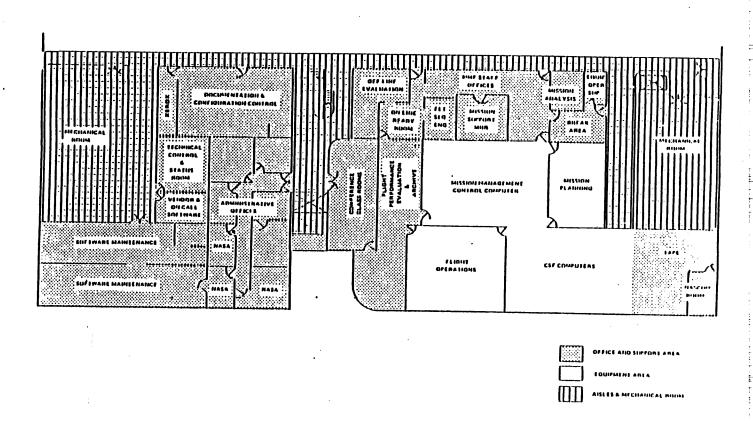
Landsat D/D' Ground Segment Facility, Building 28 (Wing A, Second Floor)
